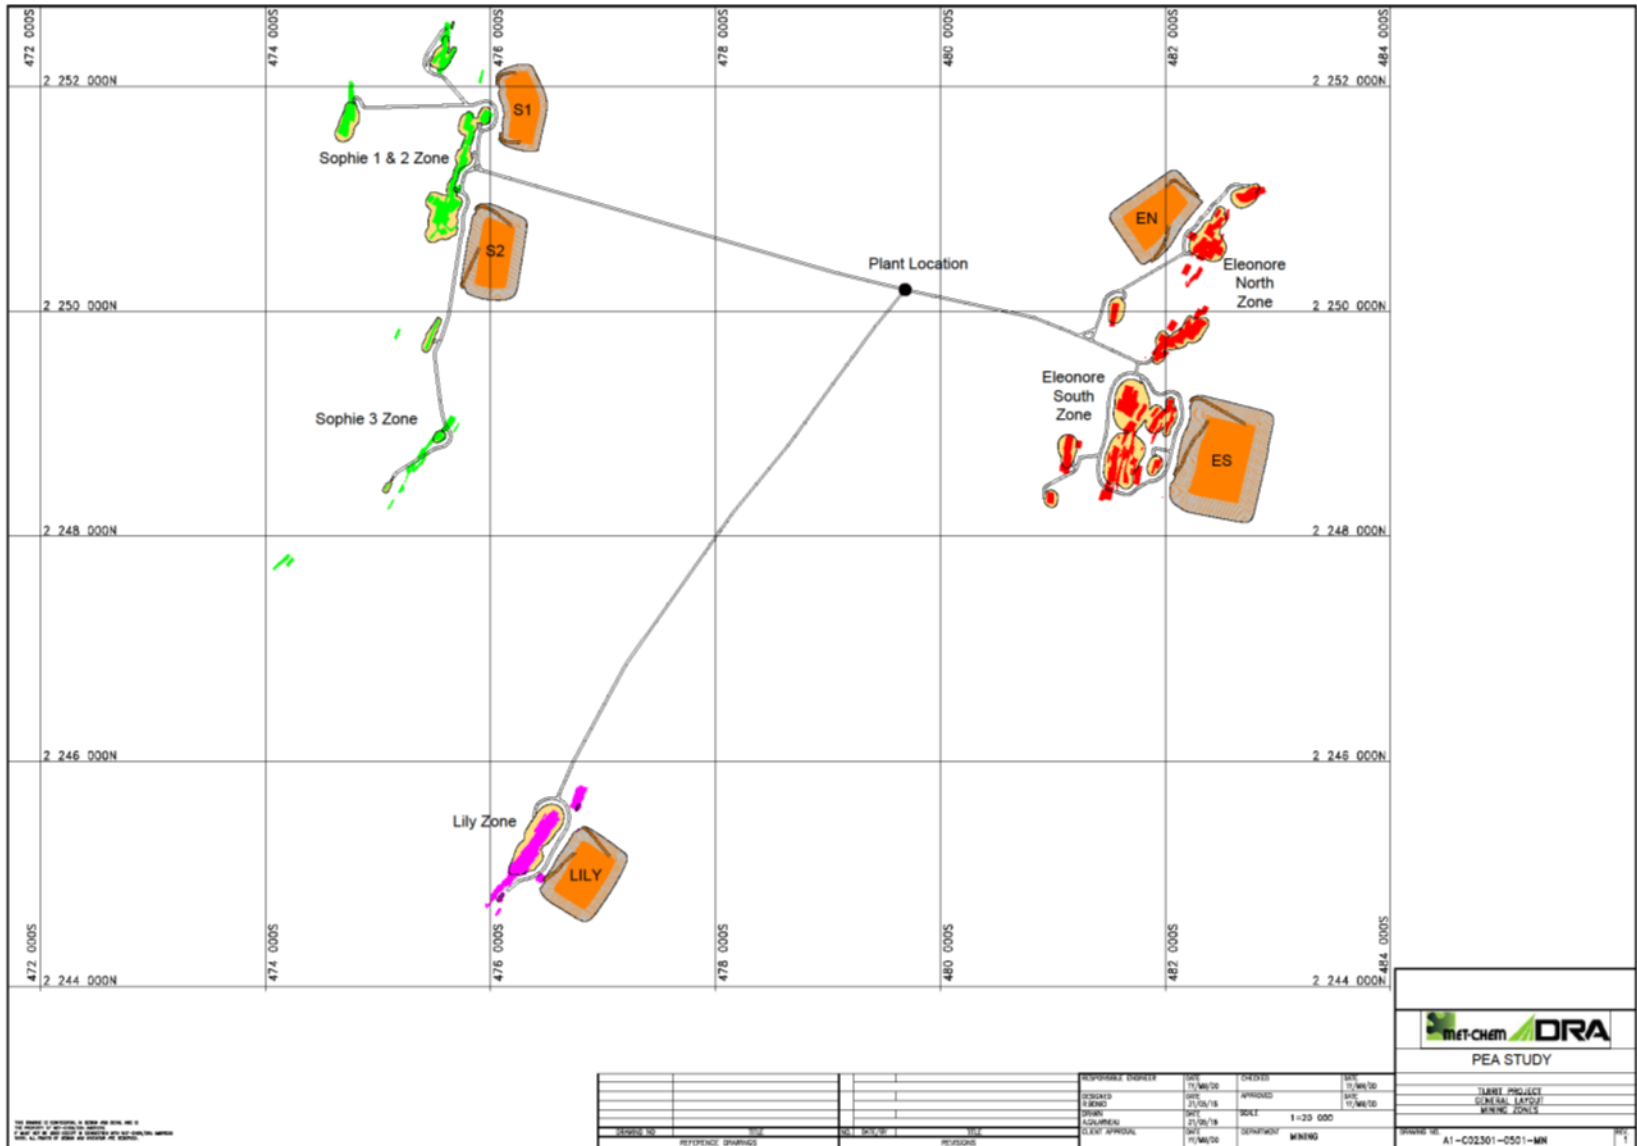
Plan View (Lily-Sophie-Eleonore)
